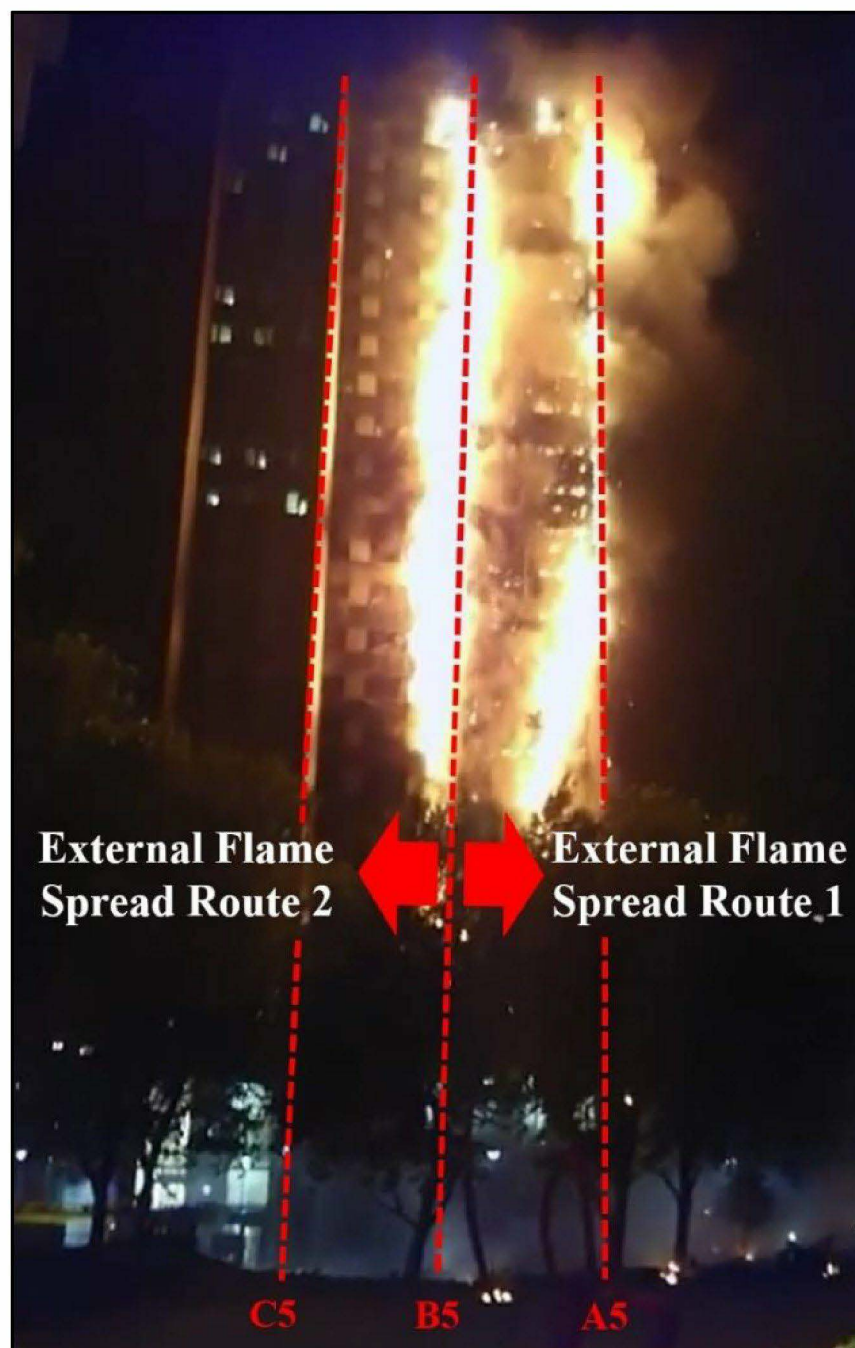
Fire on East elevation of the building envelope on 14<sup>th</sup> June 2017, estimated time 01:36
